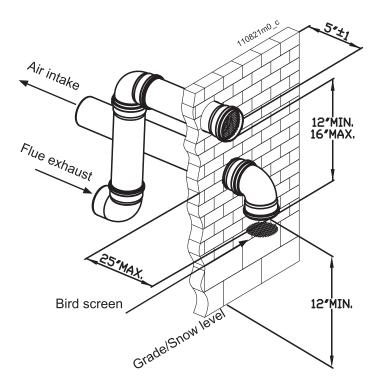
Two pipes sidewall termination of air and vent (if space permits)
